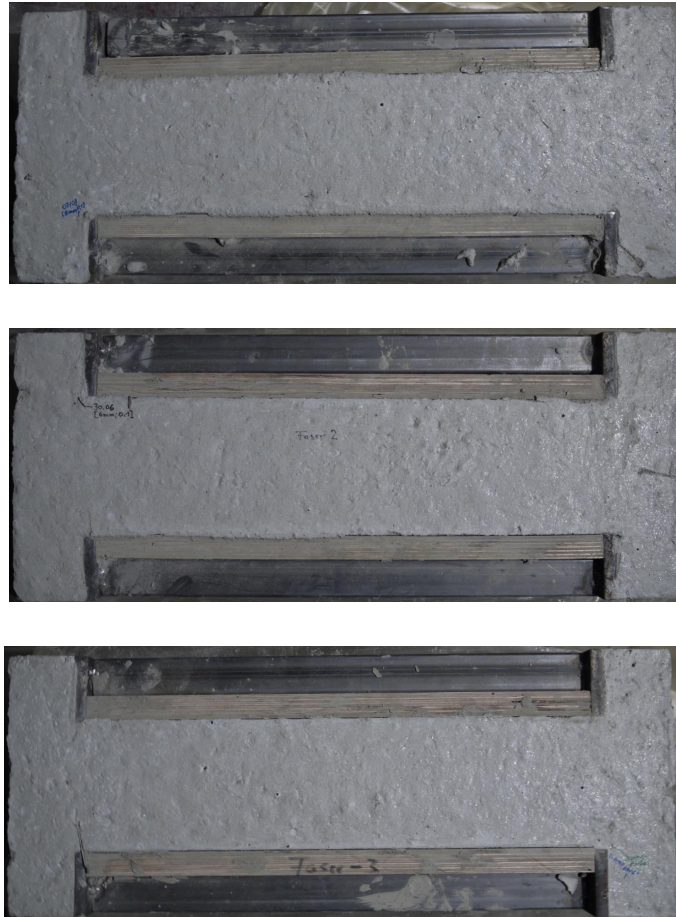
Small scaled H-shaped concrete specimen of C20/25 concrete
